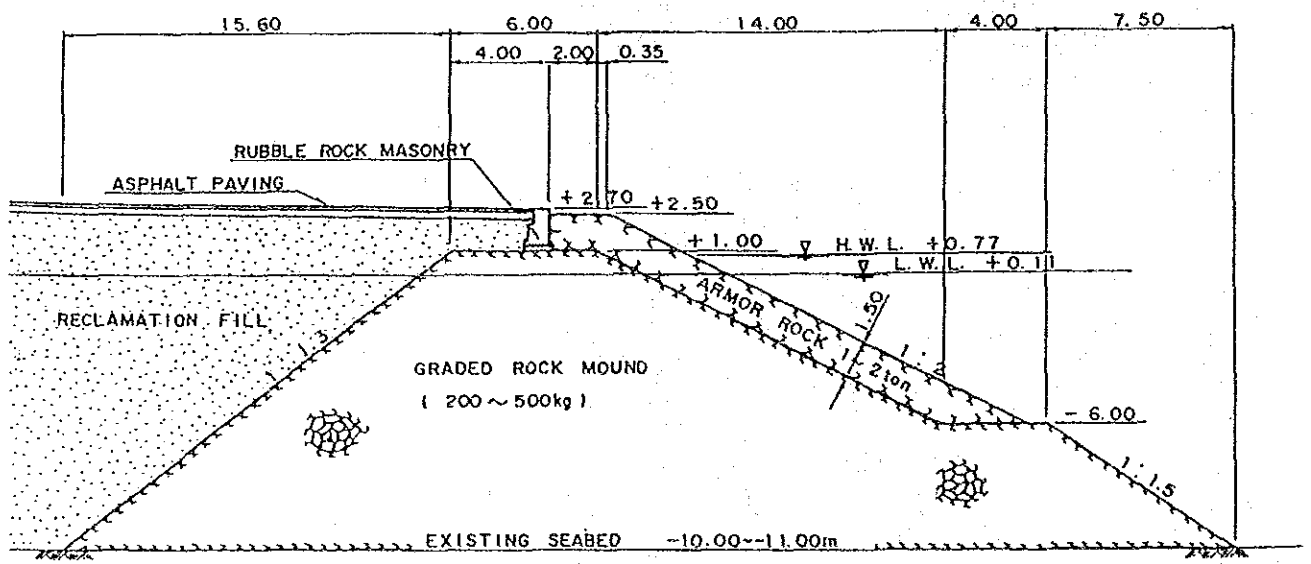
Typical Cross Section of North Pier Revetment - Type B
